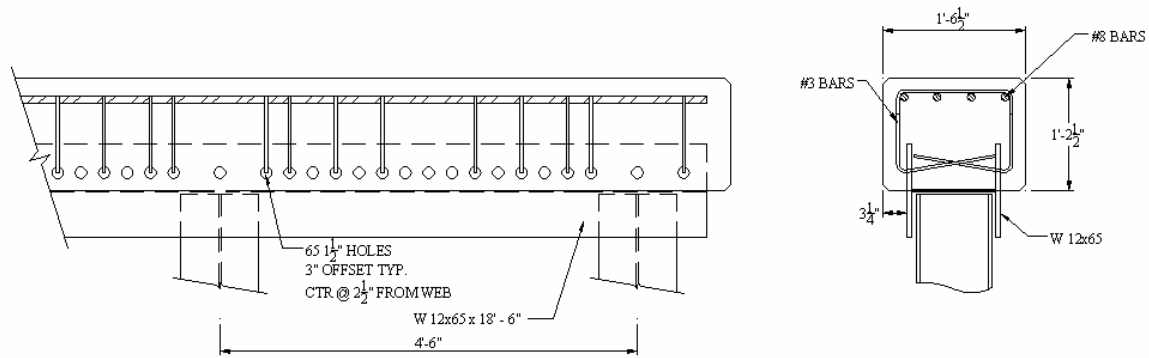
Precast abutment cap used on Mt. Vernon Road Bridge
